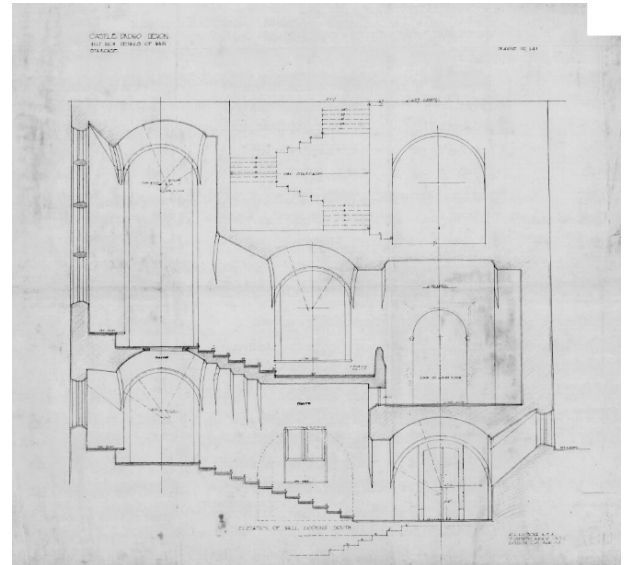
Main Staircase – Elevation of Wall Looking South (Lutyens 1914)
